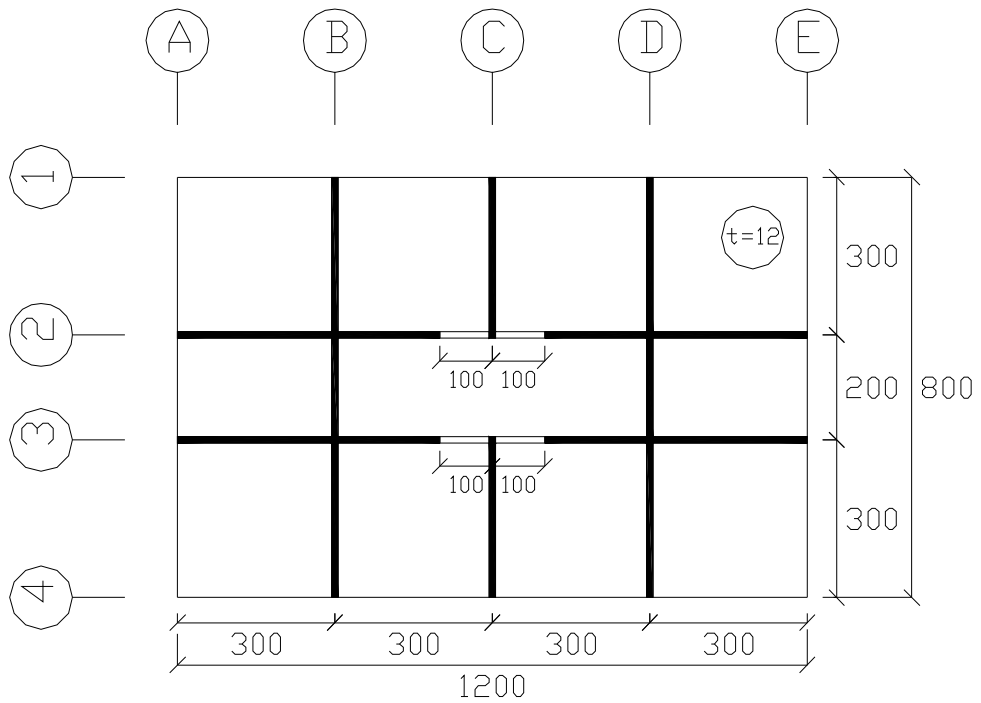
Typical plan view – Plan No. 7 (units in cm)
